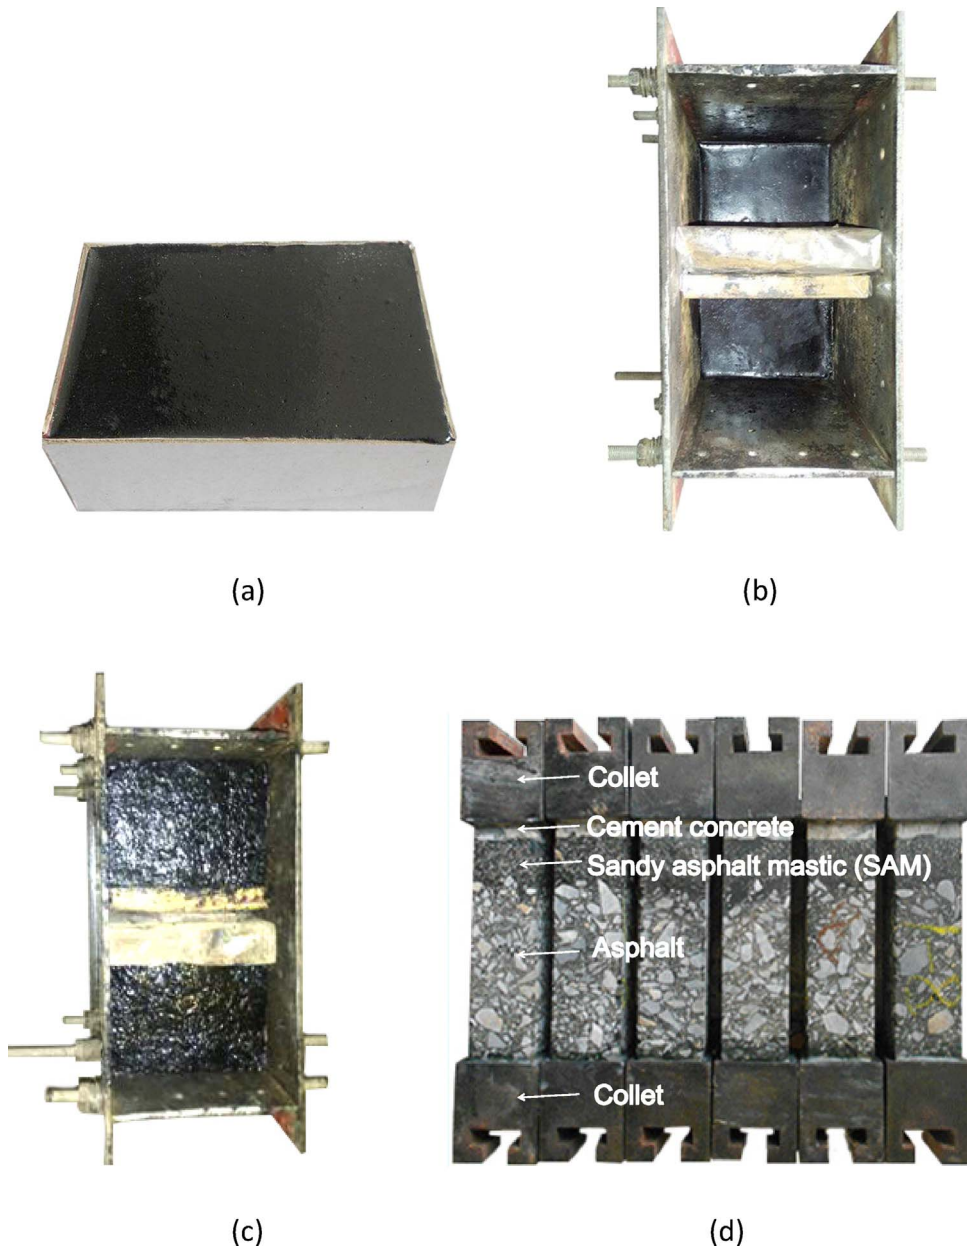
Asphalt-SAM-concrete connection specimen preparation.
